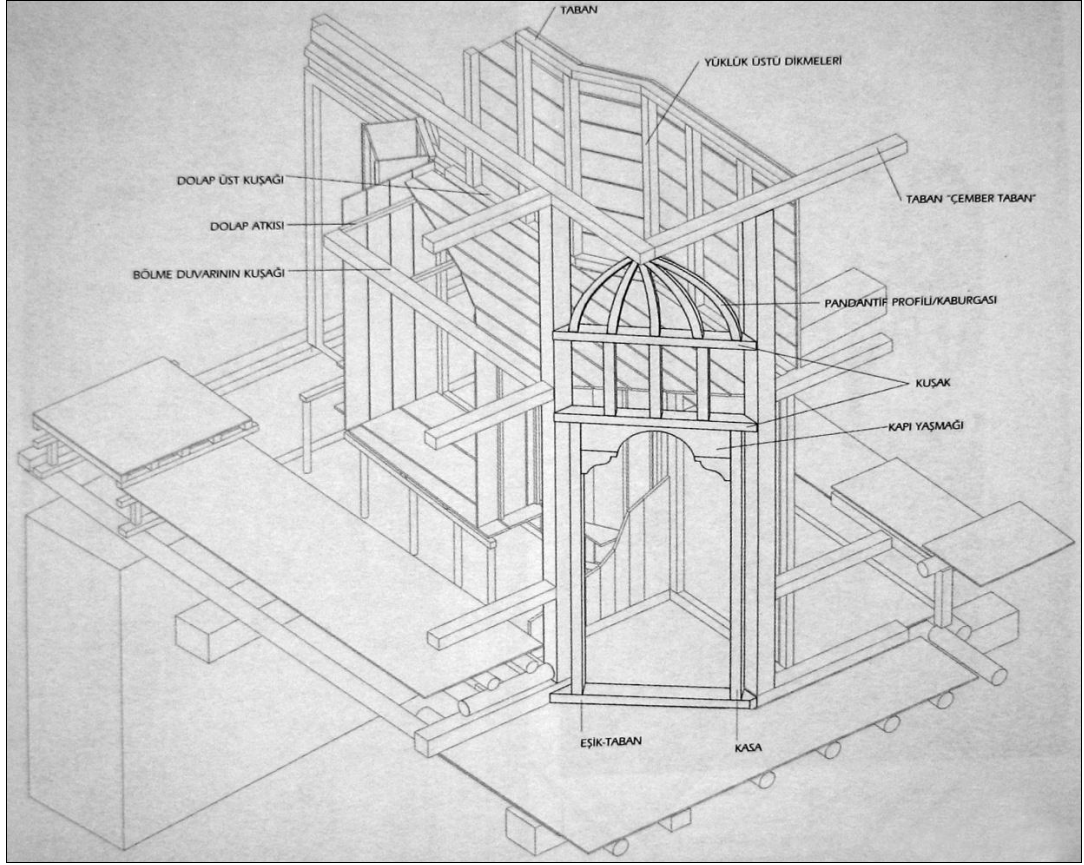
, Door openings Type 5, Sandıkoğlu Konağı Main room door (Ekinci, 2005: 78)
